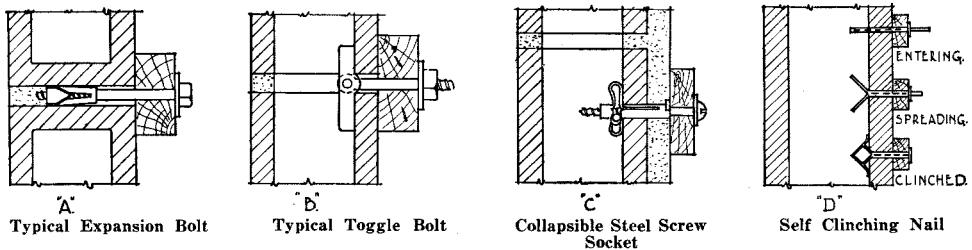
Fasteners used with hollow tile wall construction (from *Hollow Building Tile Association, Handbook of Hollow Building Construction*, 42).
